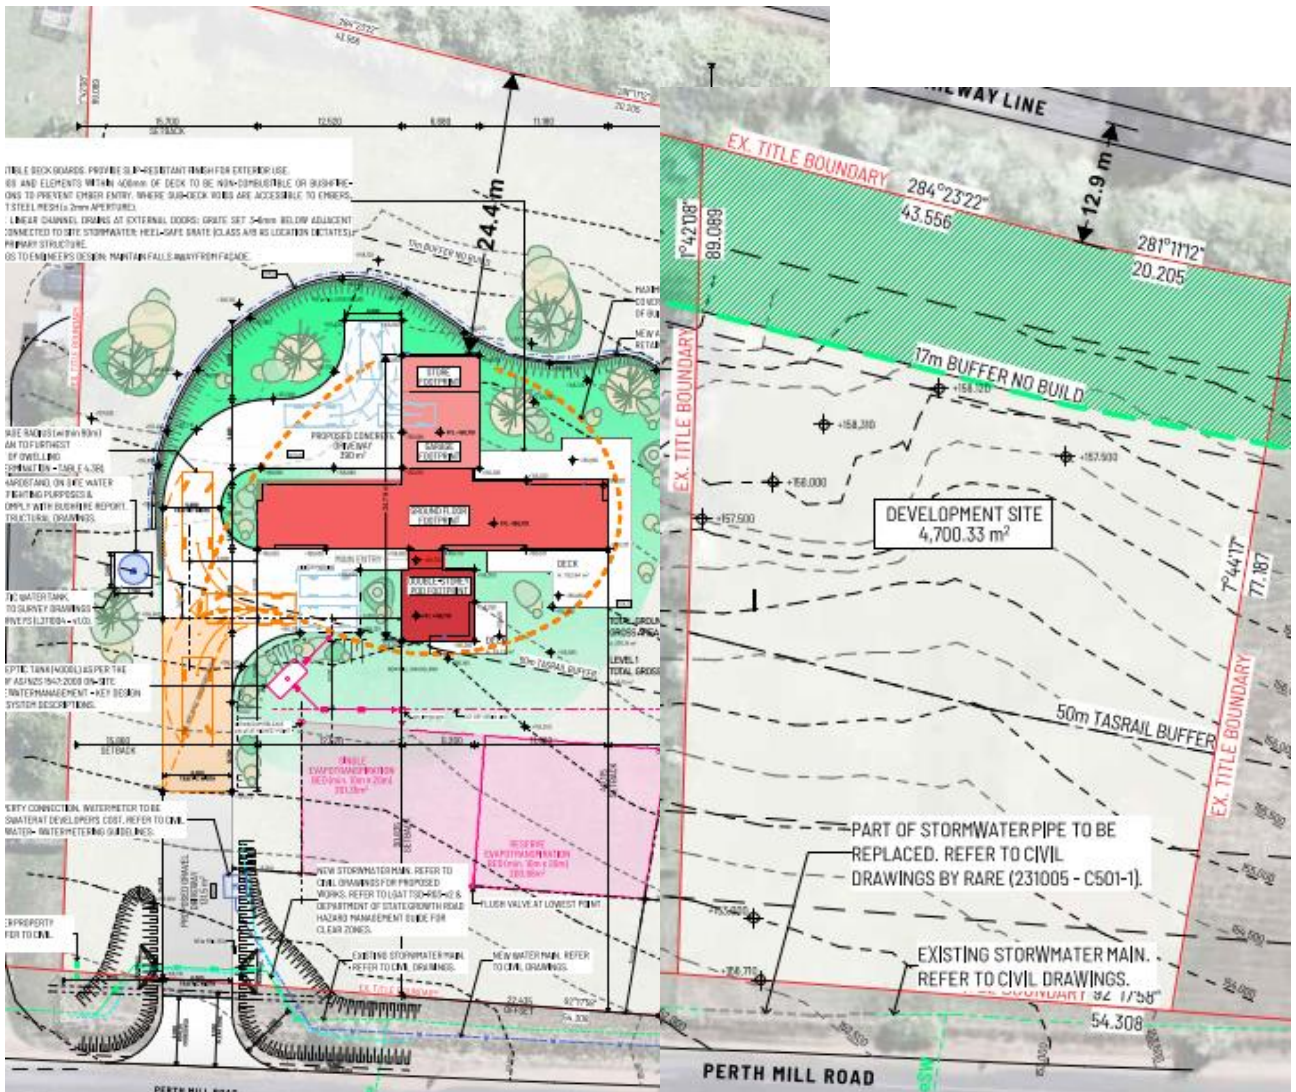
Proposed building location(right) and site plan (left), including setback from railway line.
